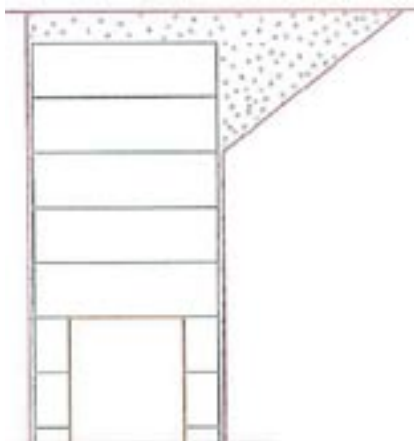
Recess forming a ramp at the upper end of a deposition hole. The upper end of the buffer blocks may become located at the tunnel floor. The picture shows pellet filling of the ramp but compacted clay blocks may be an alternative.
